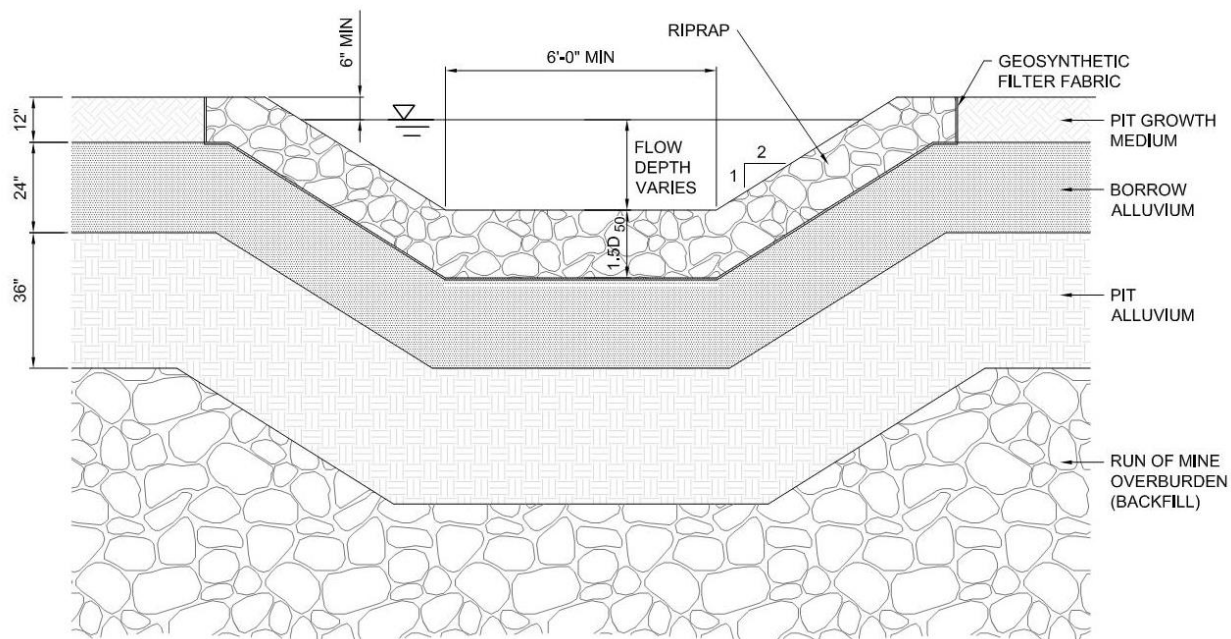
Typical Cross-section for Re-established Drainage Channel over Pit Backfill
